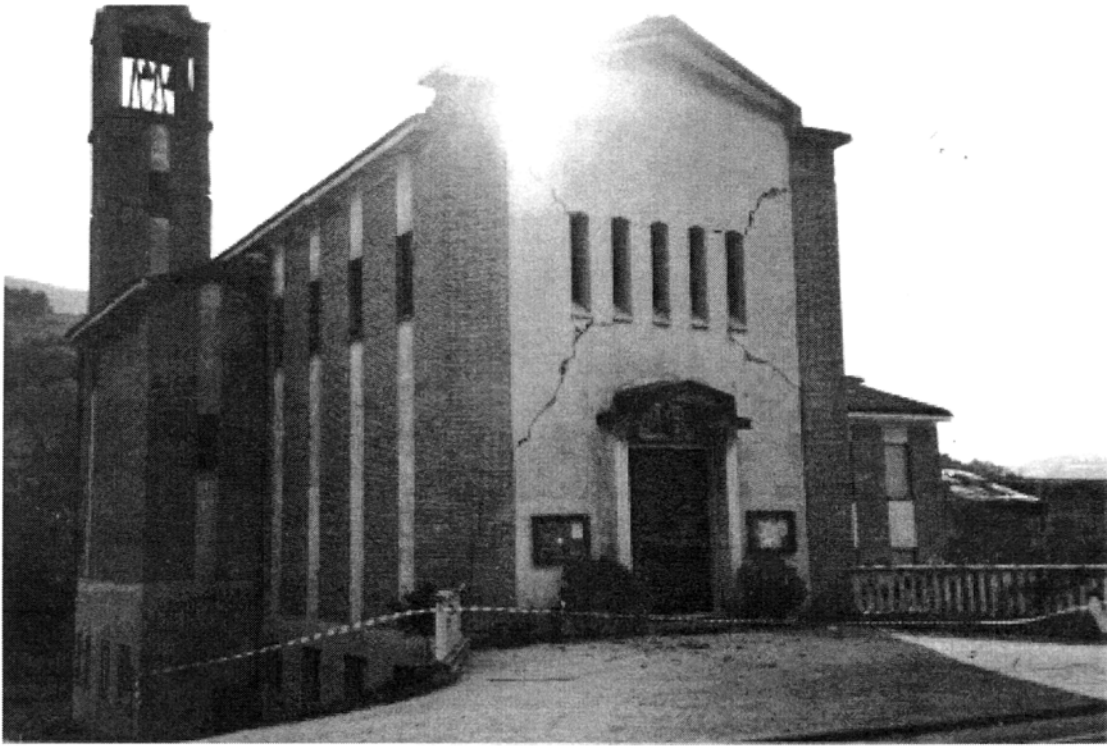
Church with masonry-infilled reinforced concrete frame: Nocera Scalo
